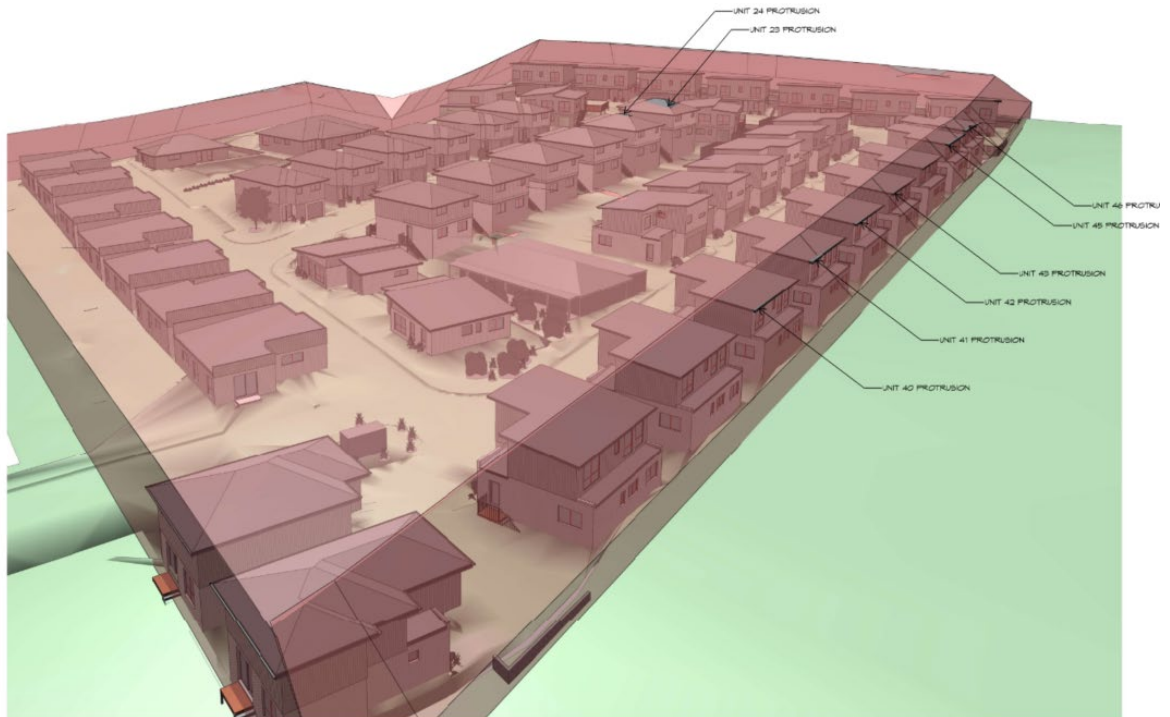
Building Envelope Diagram 1 showing envelope protrusion for units 23 and 24, and eaves excluded by 8.4.3 A3 from southern boundary (source: Application documents)
